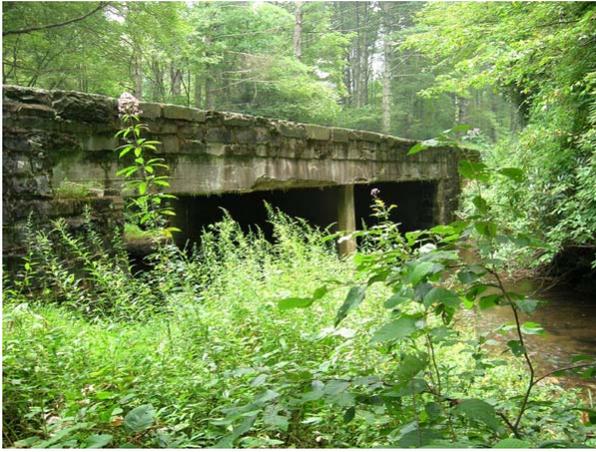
Bridge at MP 223 has vegetative growth on concrete and stonework. Concrete appears to be degrading (Photo by Ian Firth, 2005.)
